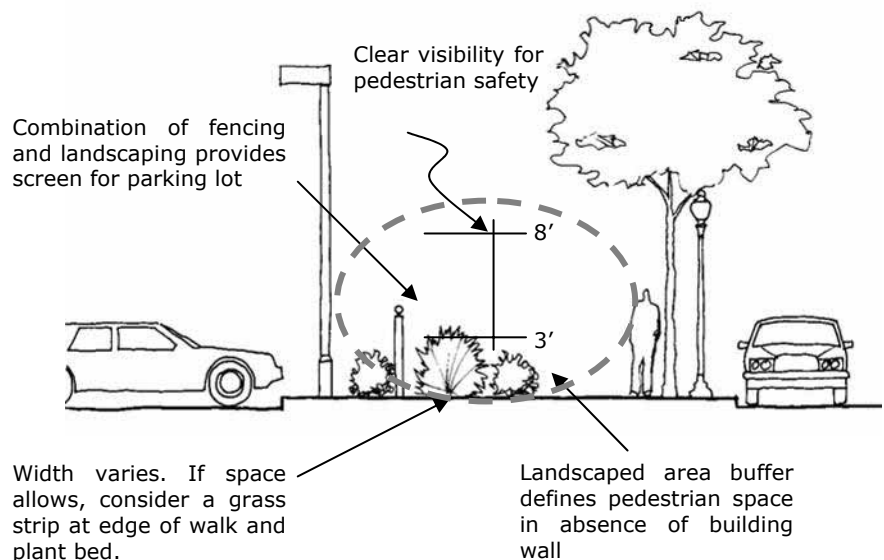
Illustration of landscape buffer between sidewalk and parking lot.
